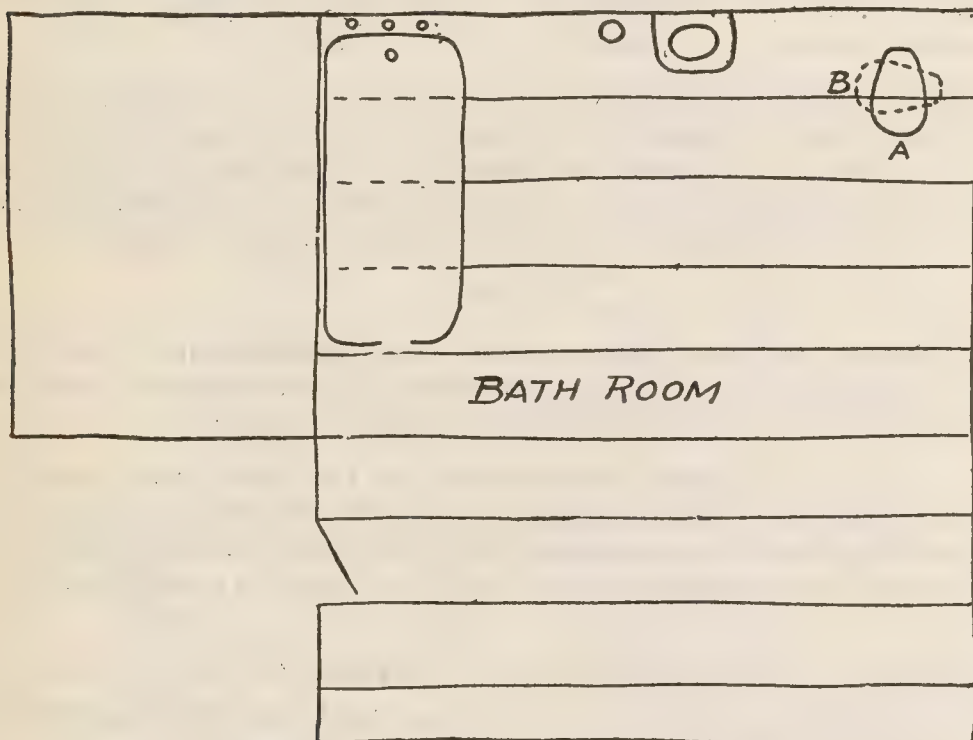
,939.—Plumber's proposed arrangement of bath room fixtures for minimum roughing in work and best drainage.
